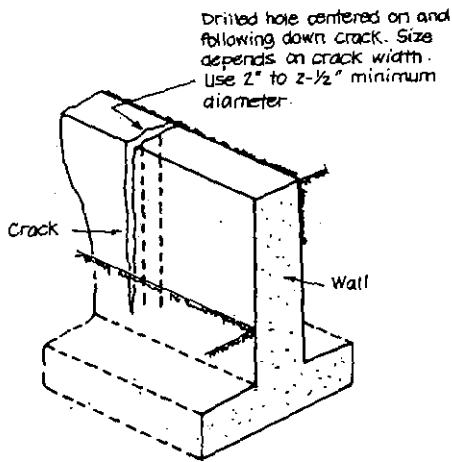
Drilling and plugging is a repair method well suited to vertical cracks in retaining walls. The repair material becomes a structural key to resist loads and prevent leakage through the crack.
